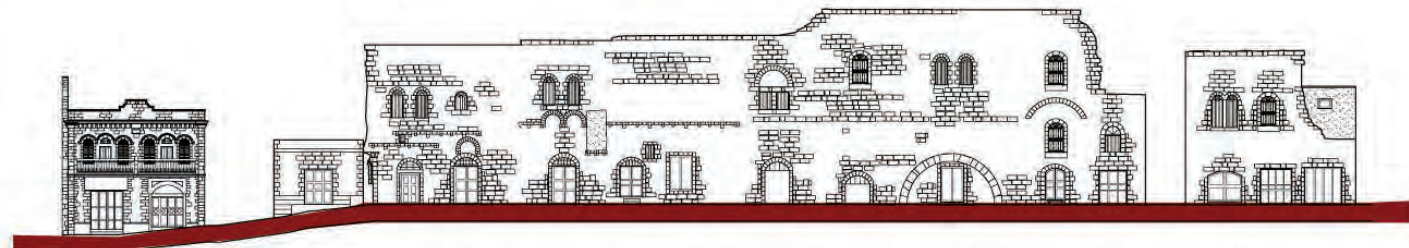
Elevations of the Pilgrimage Route, part 7
